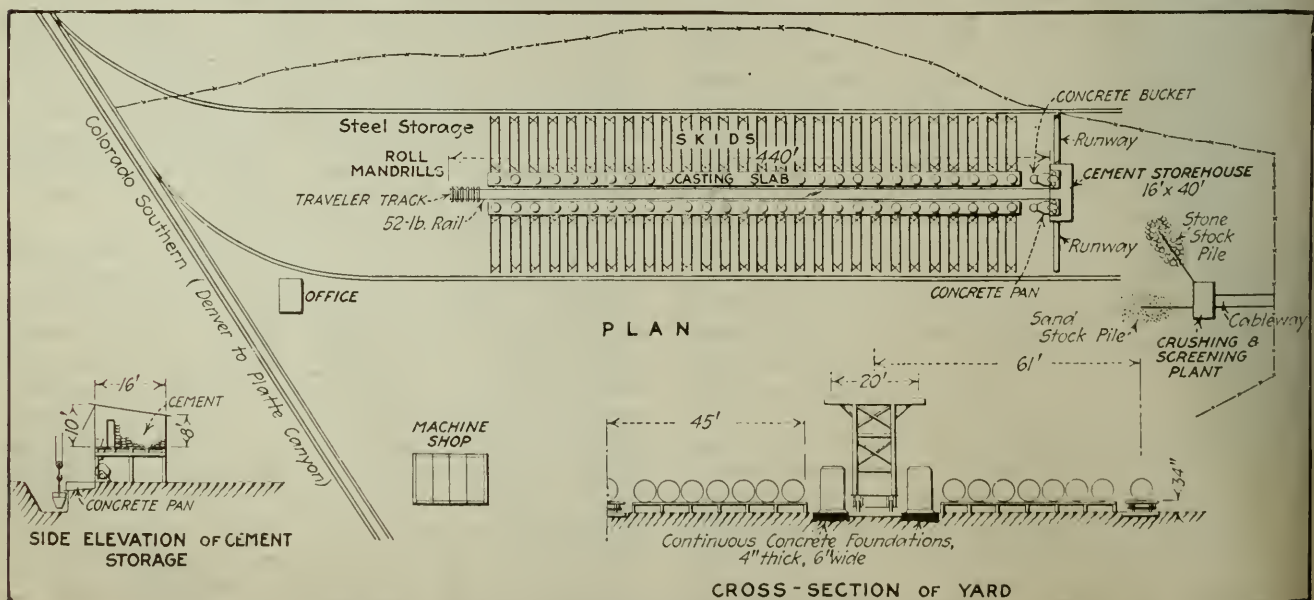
LAYOUT OF YARD FOR MAKING CONCRETE PIPE
